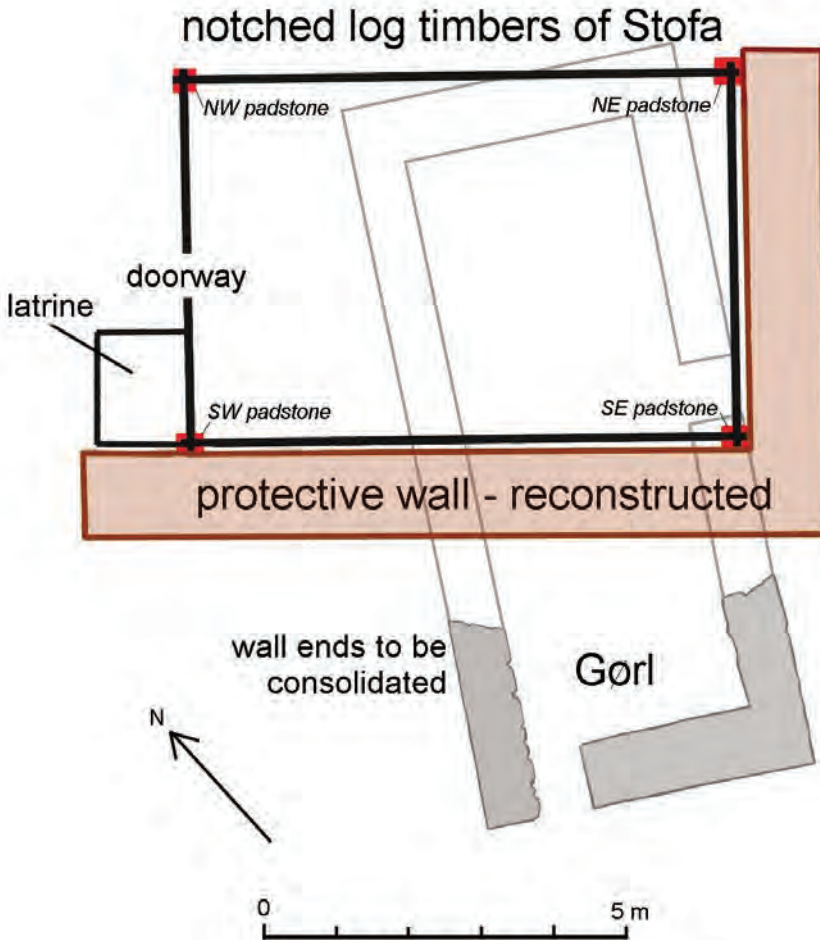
Plan of proposal for reconstruction of stofa timbers and protective wall (Ballin Smith, 2007, illus.3)
